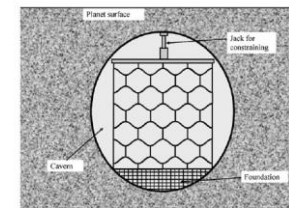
Interlocking structure built in a cavern. The foundation can be built, e.g., from regolith.
